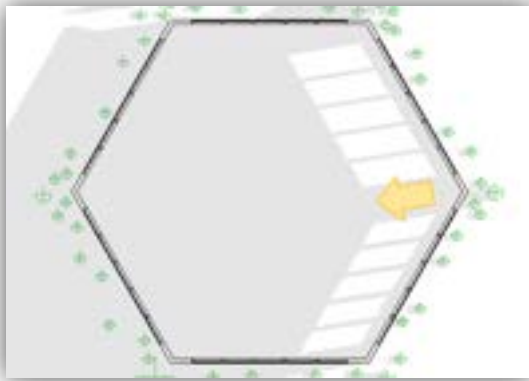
plan view at 9:00 AM on June 21st (Summer Solstice) with slab-to-slab windows and two-foot roof overhang. Source: primary.
